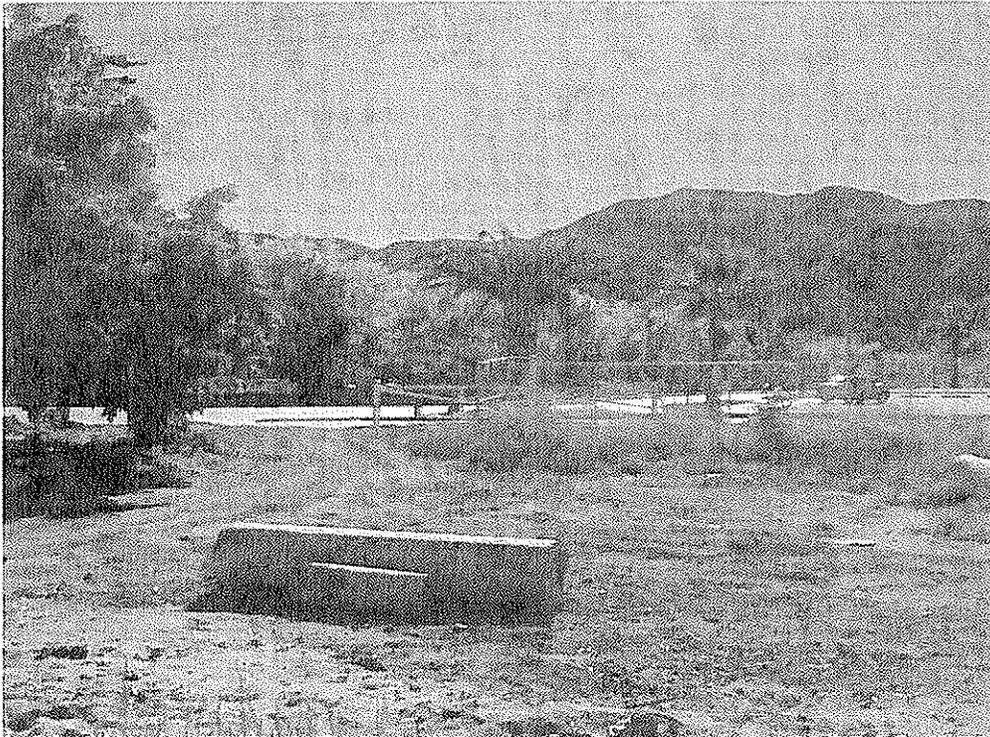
Picture of the two abandoned concrete pipes. Photo taken from the southern area of the site looking southwest.
